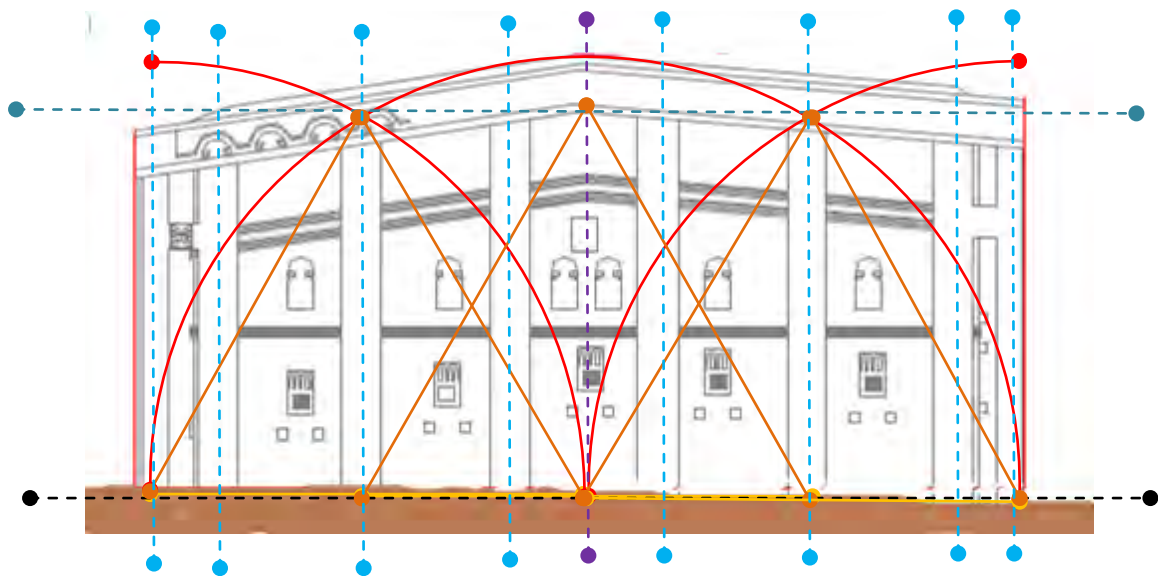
The Rare Side Elevation Plan of Bete Medhanealem
